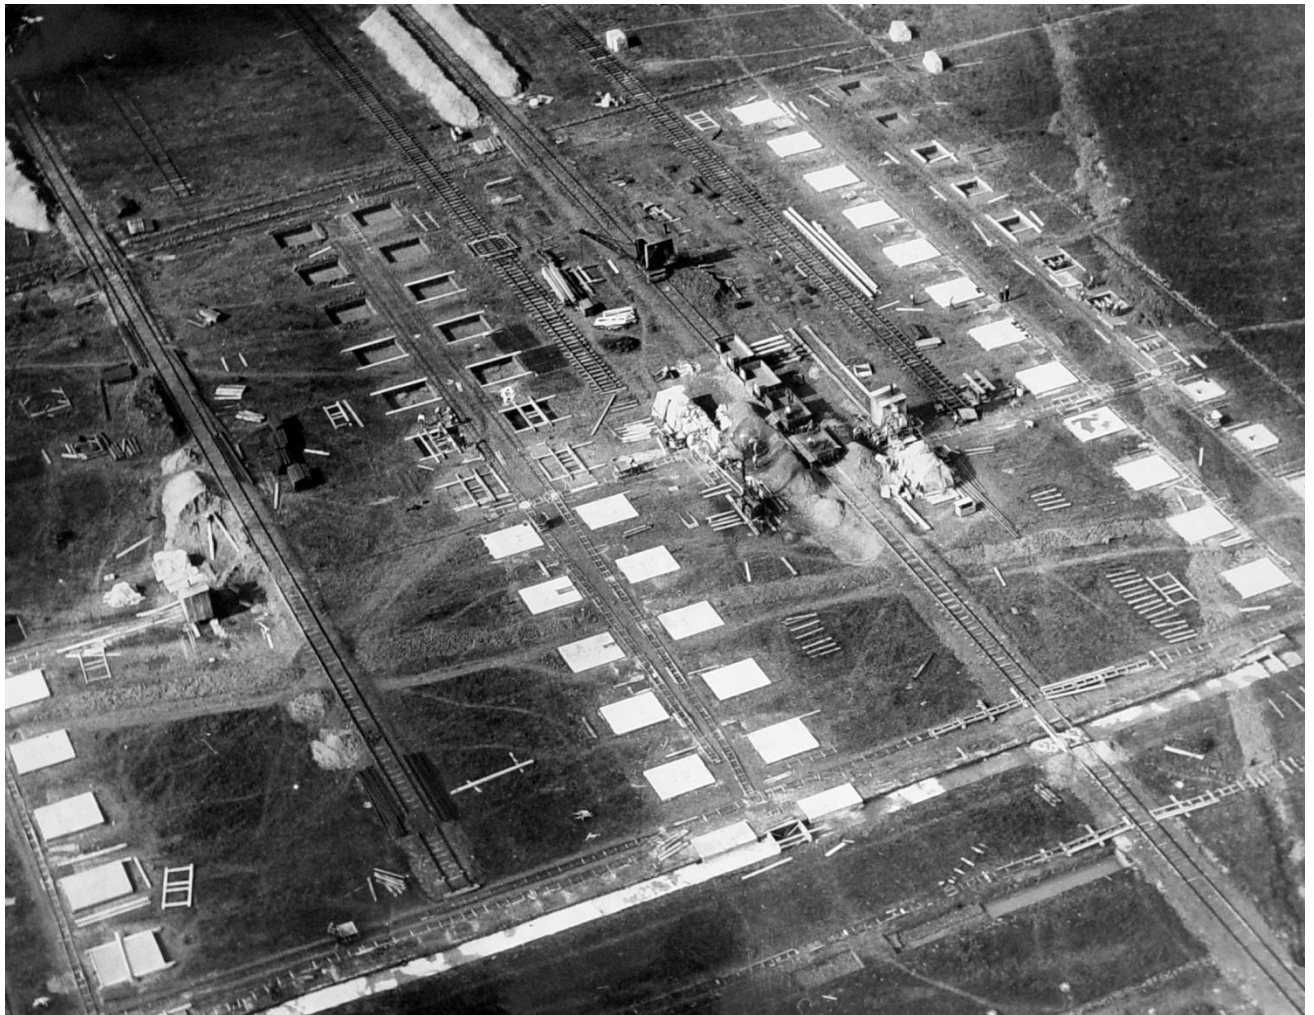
Aerial view showing the twin shed foundation blocks being constructed
